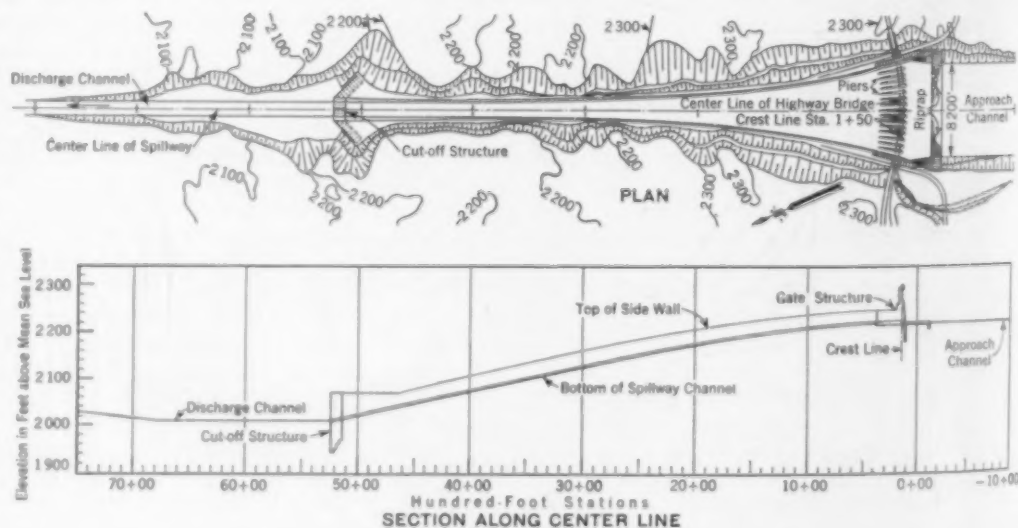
PLAN AND SECTIONAL ELEVATION OF SPILLWAY, FORT PECK DAM
